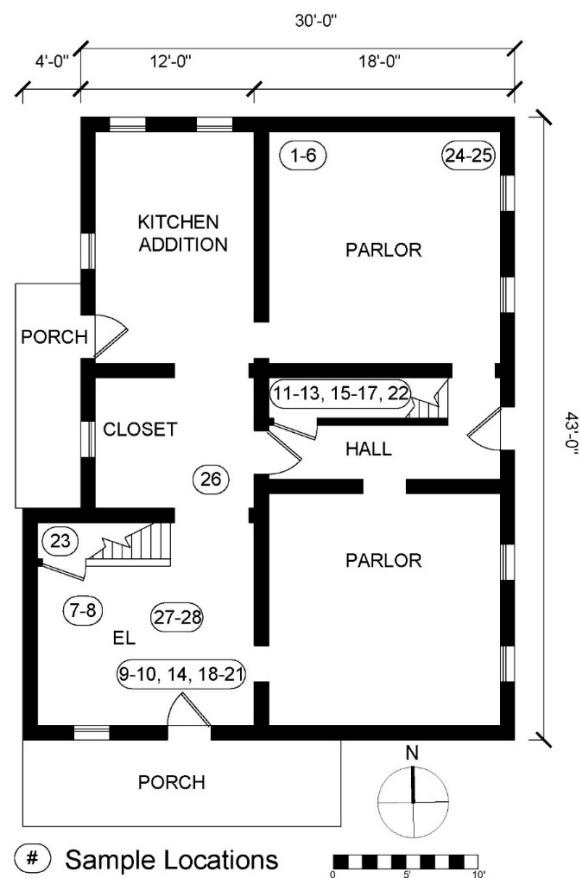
Sketch of Bronnenberg I-house ground floor plan and sampling locations. Samples 1-6 are located in the main house's attic. Samples 7 and 8 are rafters in the ell's attic. Samples 9-10, 14, 18-20 are loose samples found in the ell's attic and presumed to be from the west slope of the main house's roof above the south parlor. Samples 11-13, 15-17, and 22 are located in the closet below the main stairs. Sample 21 is a loose tongue-and-groove floorboard found in the ell's attic. Sample 23 is located in the closet below the ell's stairs. Samples 24-25 are located in the crawlspace of the north parlor. Sample 26 is located in the crawlspace of the hallway near the storage closet. Samples 27 and 28 are located in the ell's cellar (Image credit: Christopher Baas).
